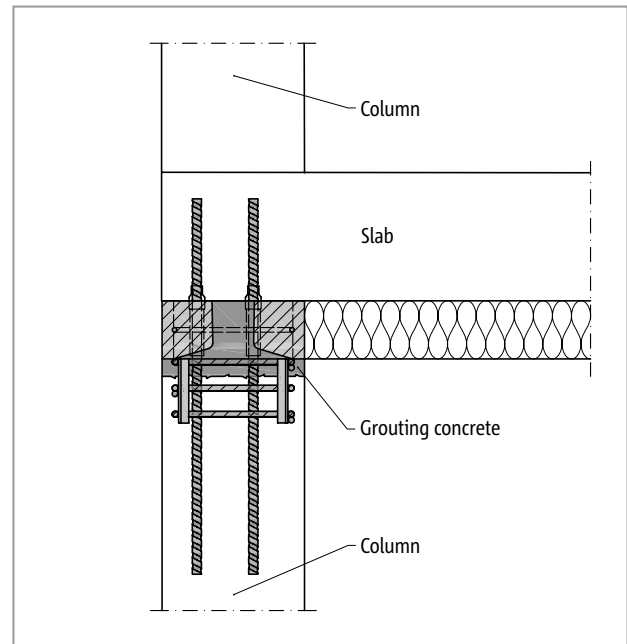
Schöck Sconnex® type P: Connection of an edge column to the above lying floor
